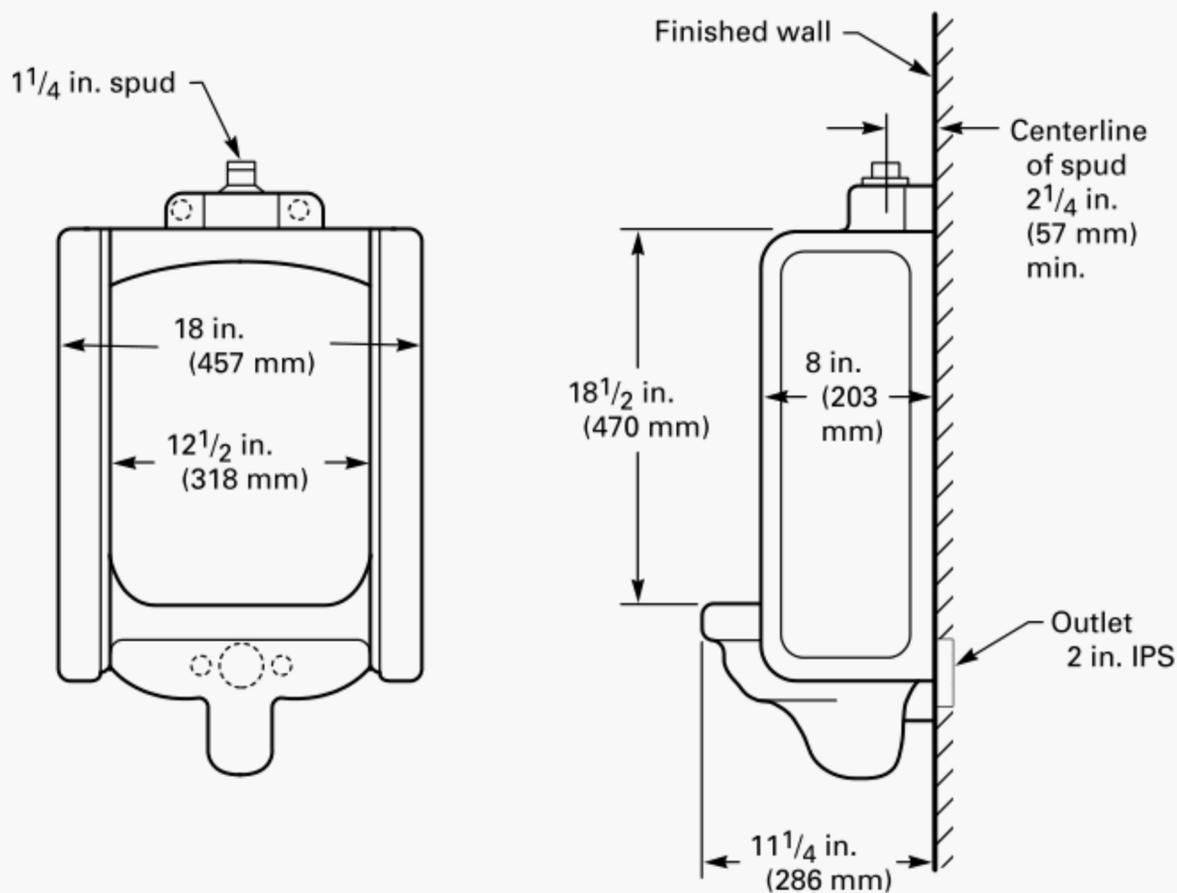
Wall-Mounted Blowout Urinal With Extended Shields
